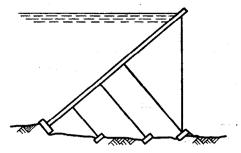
TYPICAL CANTILEVER TYPE STEEL DAM
